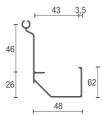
DETAIL OF CONNECTORUse of aluminium joint screwed down and end closed with PE-LD pad
